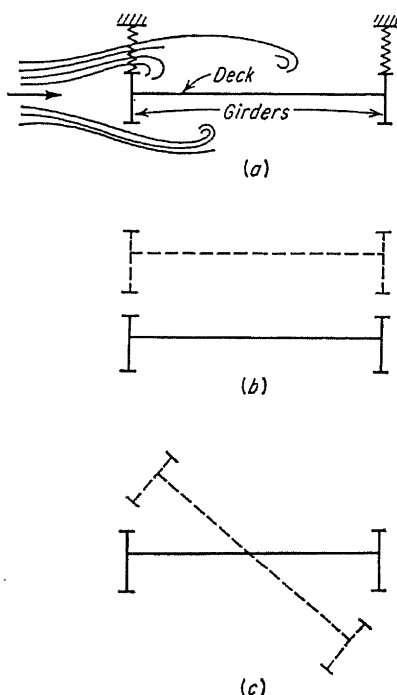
Girder-stiffened suspension bridge. (a) Formation of Karman vortices; (b) vertical modes; (c) torsional modes.
